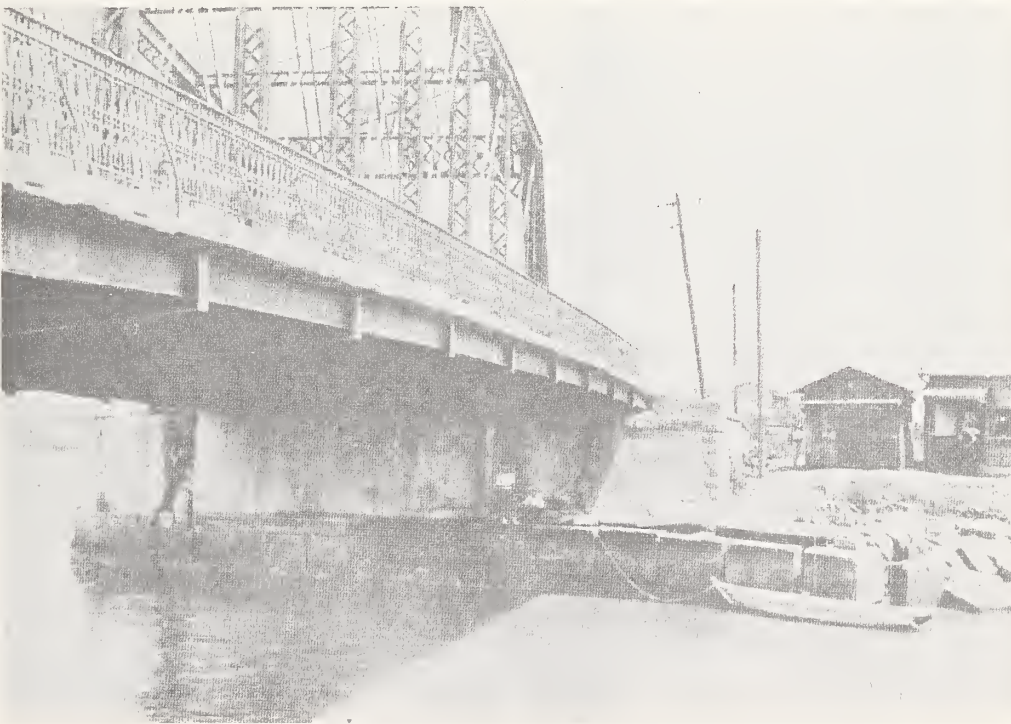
Damage to the right-bank abutment of the Yamashita bridge.
